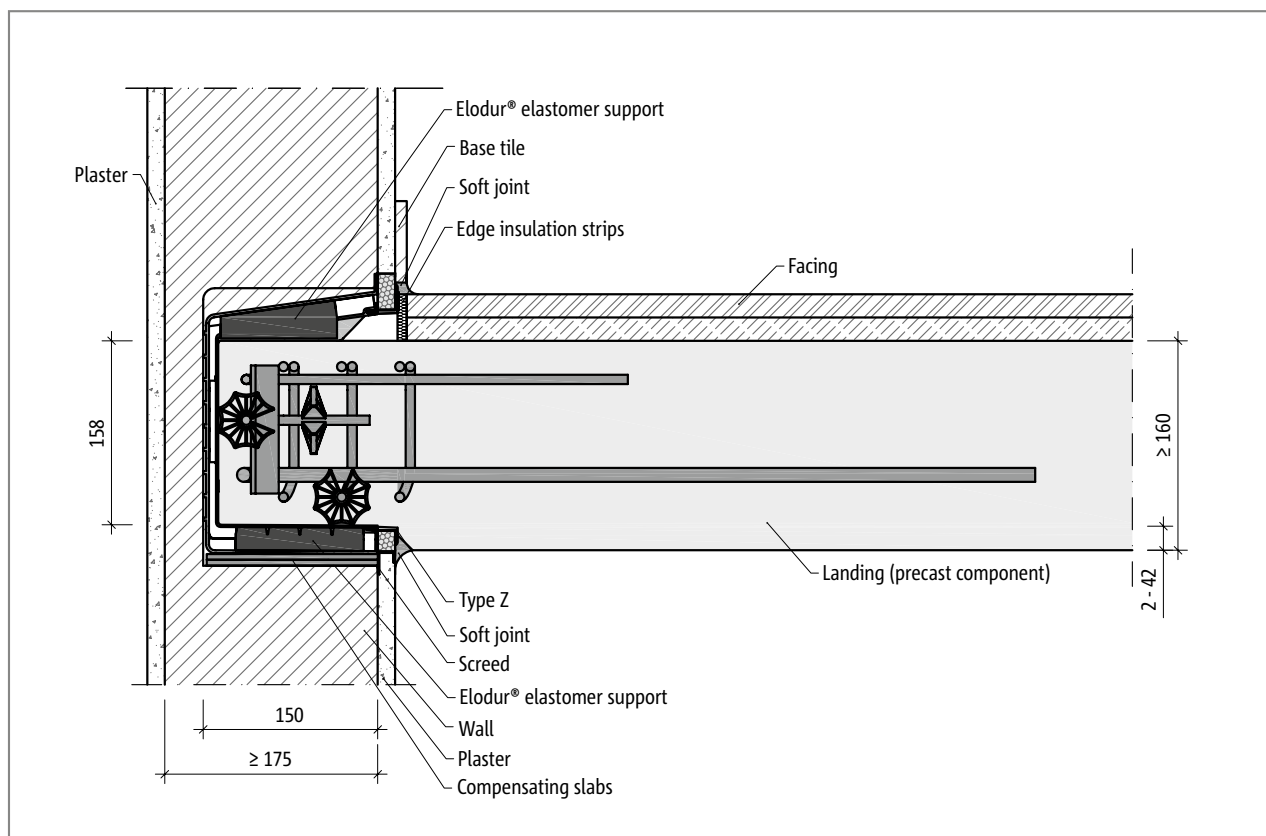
Schöck Tronsole® type Z-V+V-T: Installation cross-section precast landing
